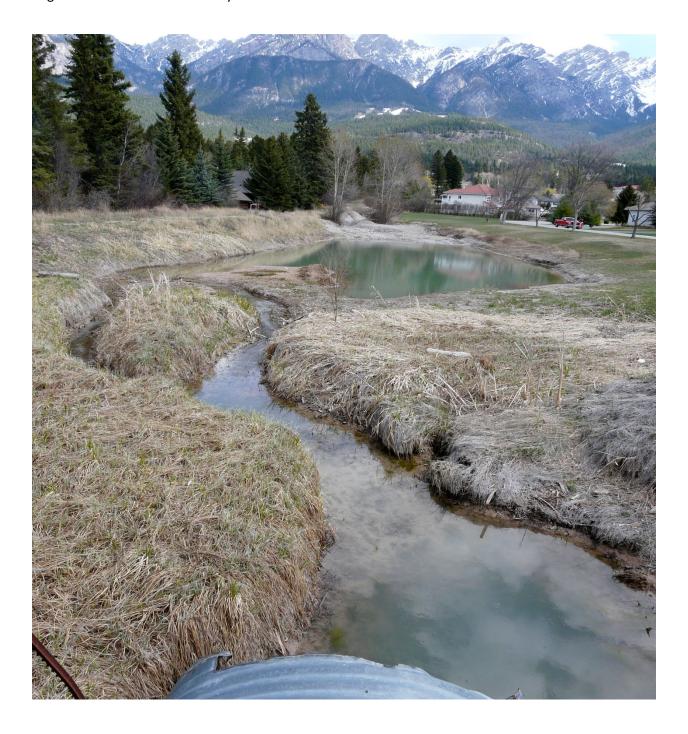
Cold Spring Creek outlet of debris trap showing siltation buildup up stream of the culvert
